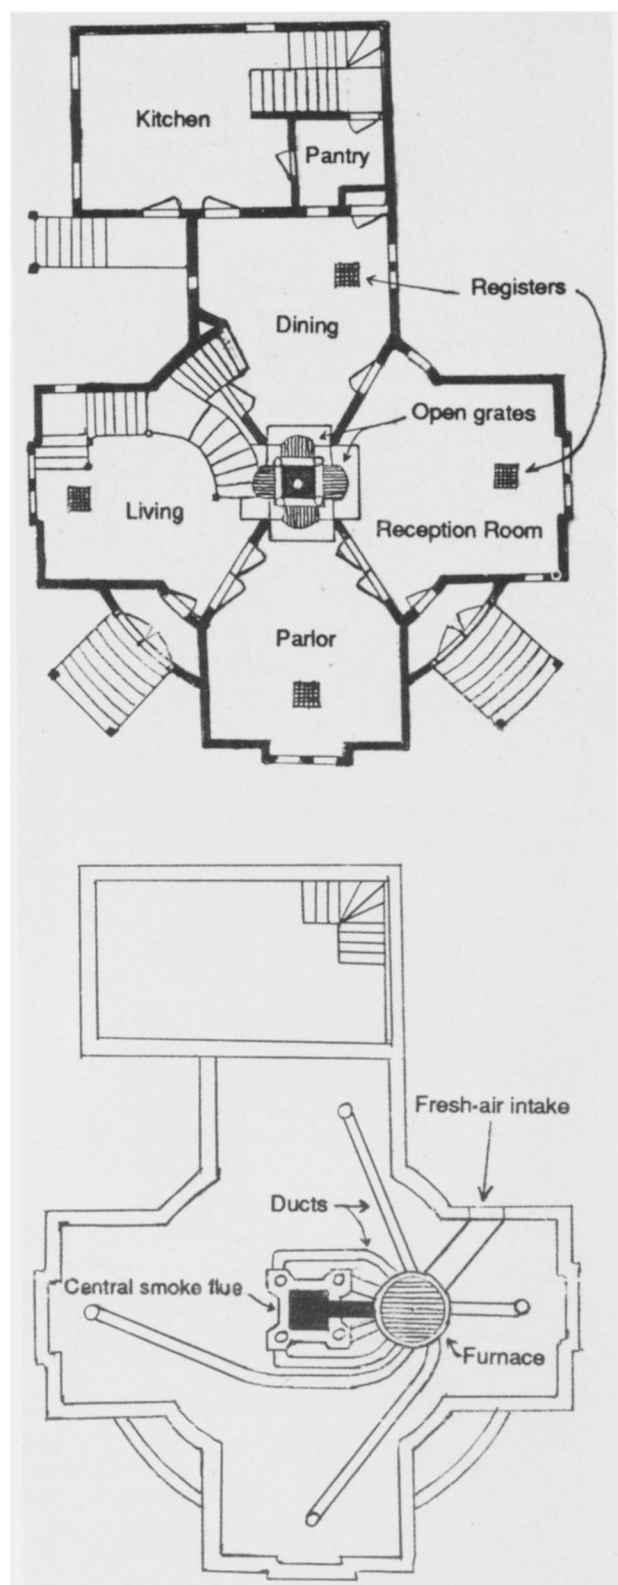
Basement and first-floor plan, A. F. Nightengale house, Ravenswood, Ill. Based on Cookingham and Clarke's rendering in *Inland Architect and Builder* 7, no. 6 (April 1886): facing 55. (Drawing, Gavin Townsend.)
